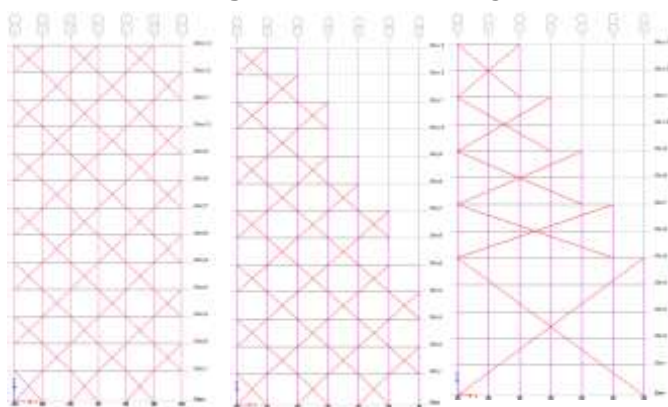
Elevation of regular, irregular building with X bracing and Mega X bracing
